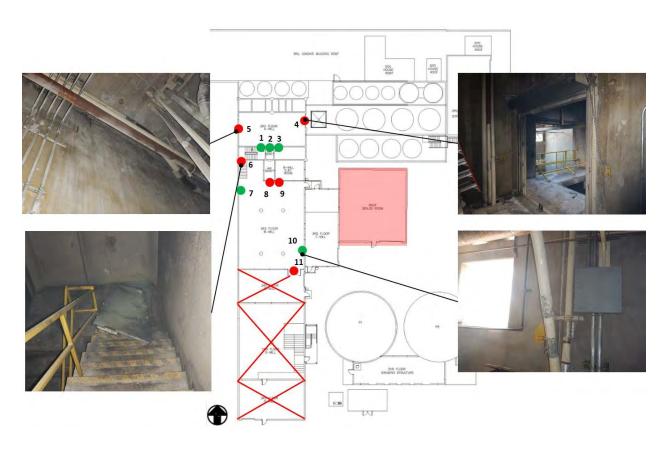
Mill A and Mill B Level 3 Exemplar Blast Indicators
